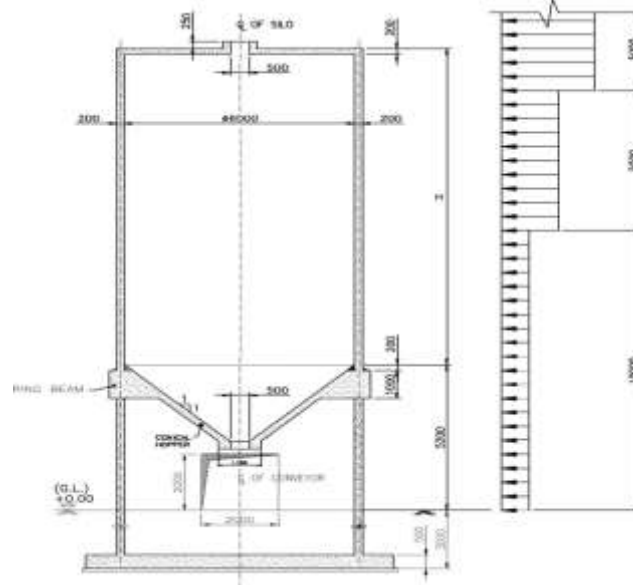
Vertical Section of Elevated RC silo (Ordinary)
